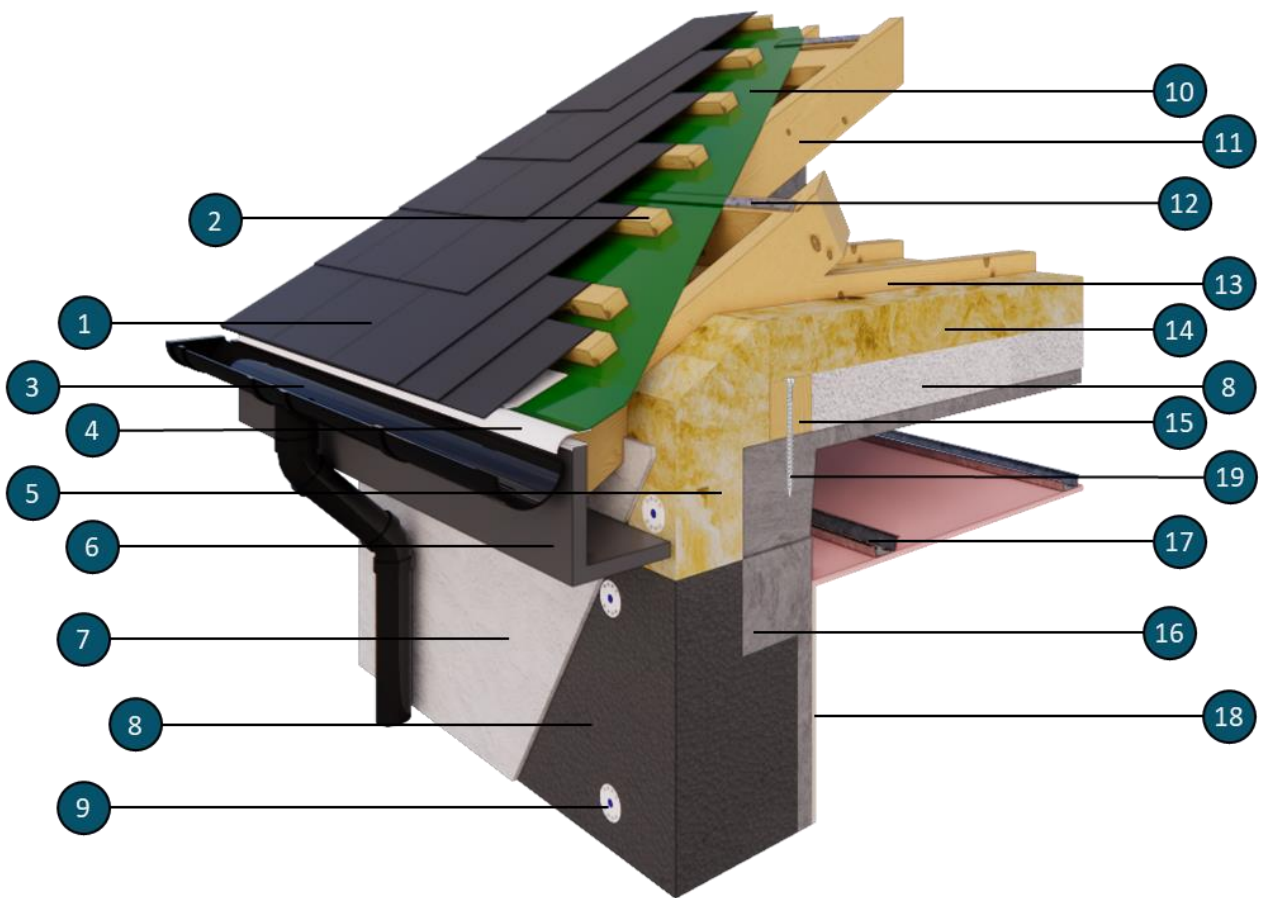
External wall with ETICS façade finish to roof junction (non-habitable attic space)
